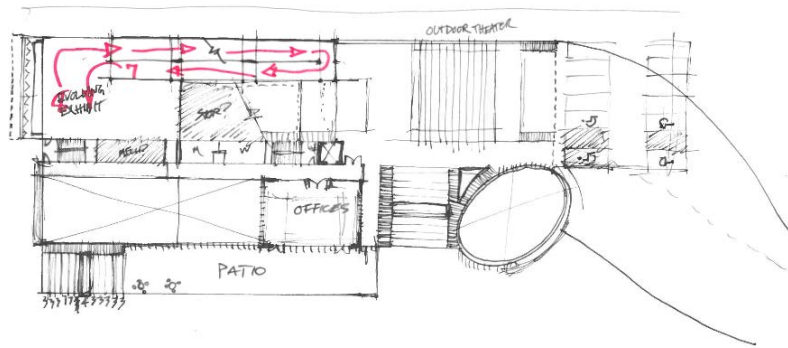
Second Floor Plan of “Bridge Flow” scheme, image by author.
